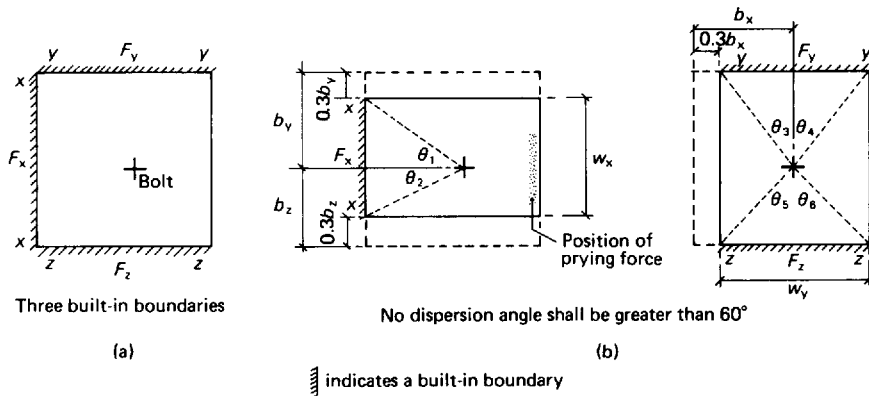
Analysis of a plate supported on three sides and loaded by a single bolt. (a) Actual plate; (b) simulation as a cantilever and beam
